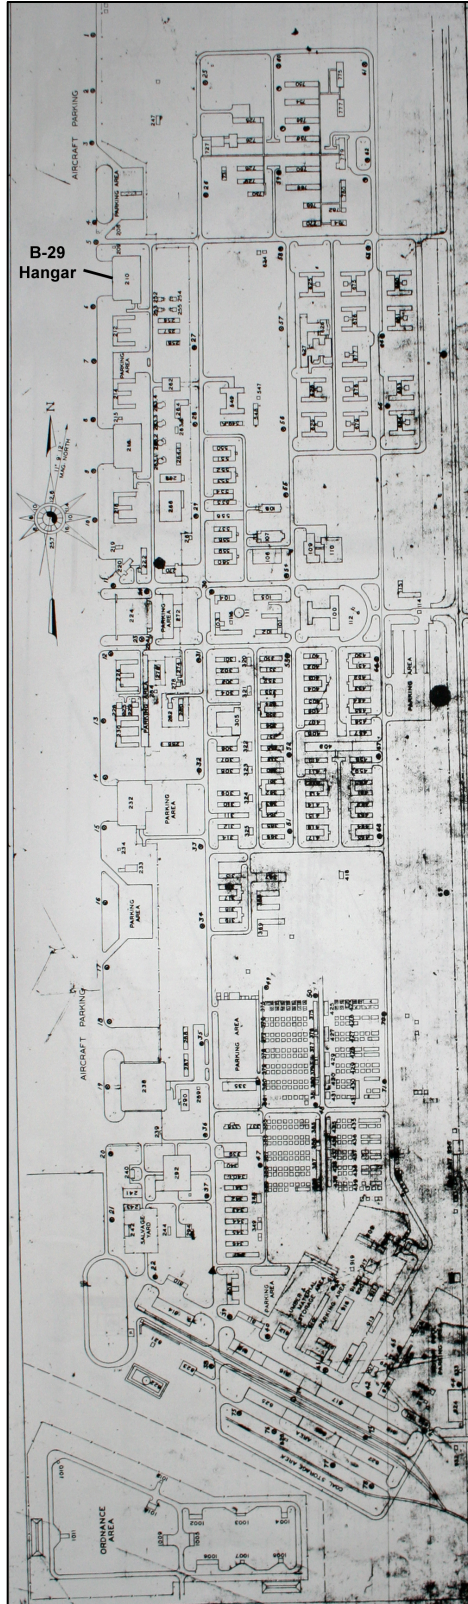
1945 Great Bend Army Air Base station layout plan. Building “210 Squadron Hangar” is the B-29 hangar. (On file at the Barton County Historical Society.)
